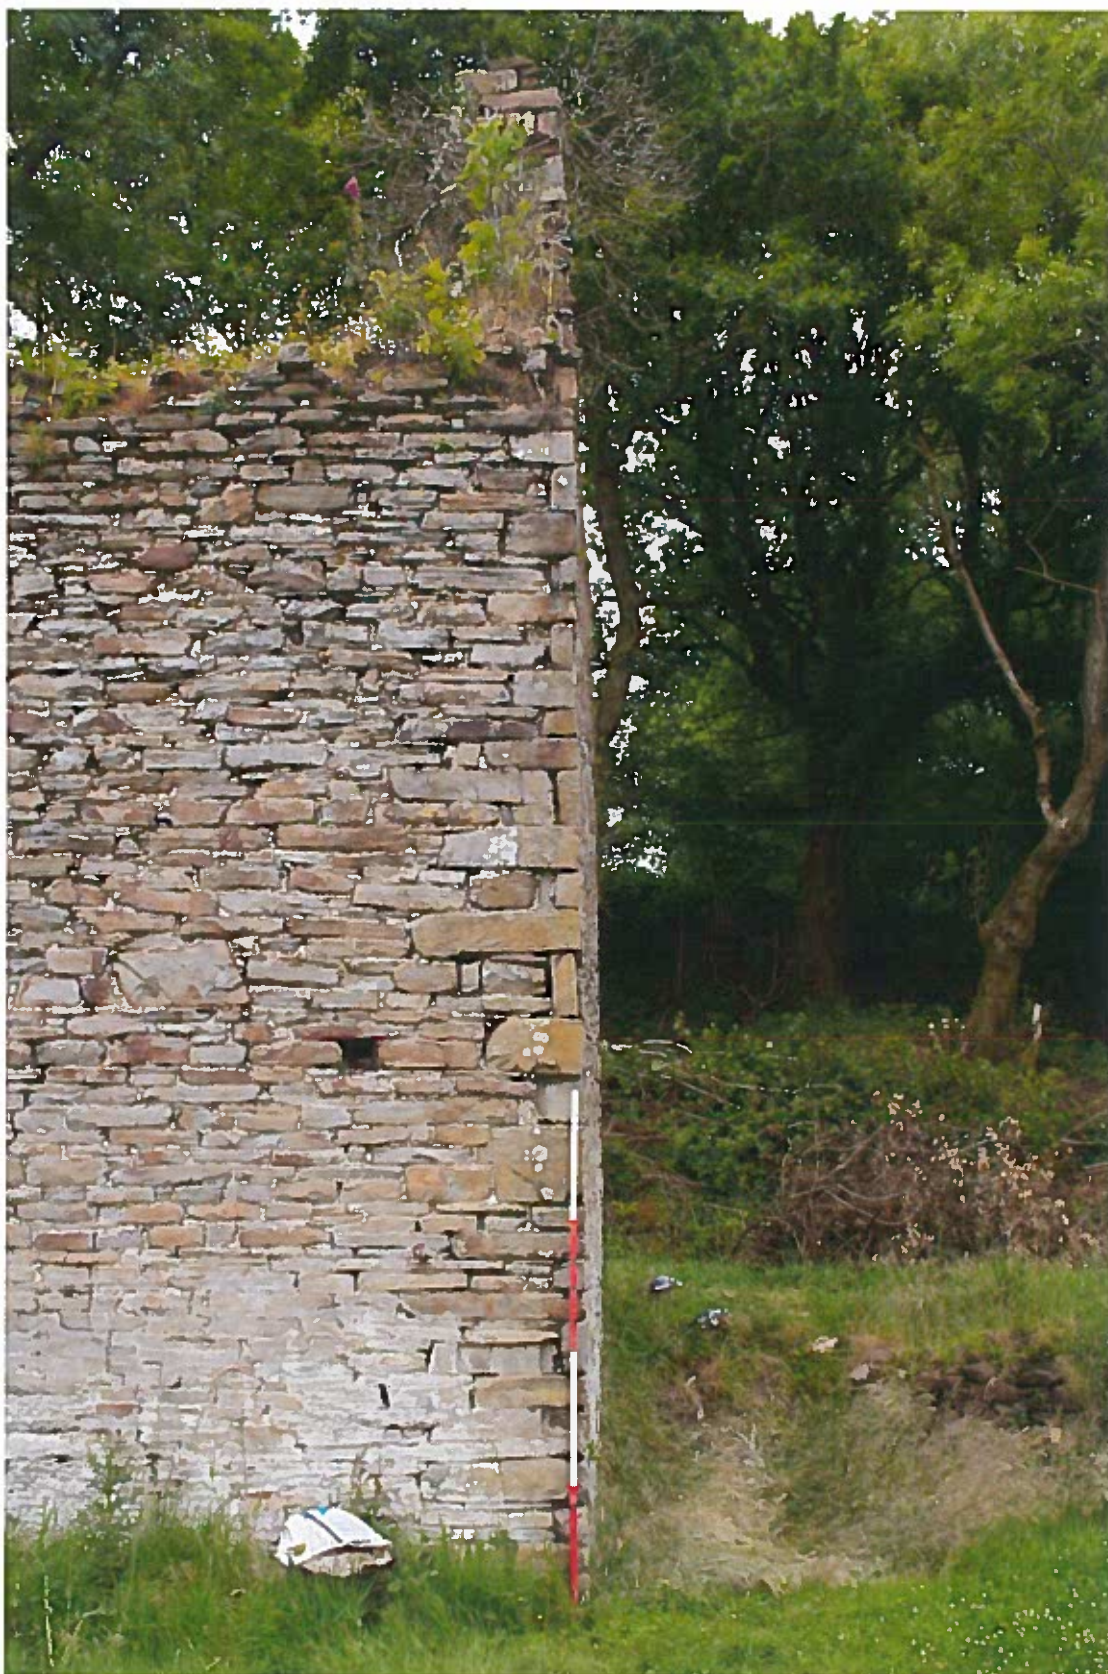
Southeast corner of mill front wall from southwest. Shot 1.
